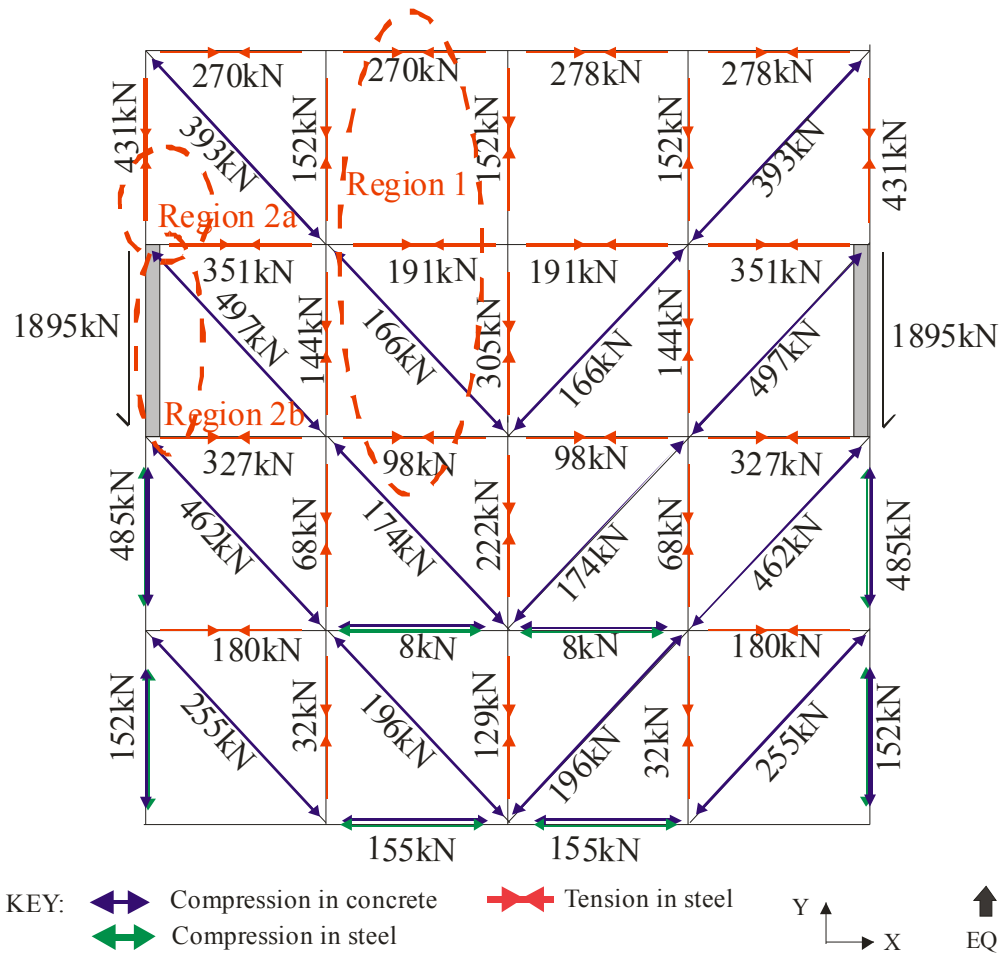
Floor force vectors from the truss analysis method for wall floor layout 1
